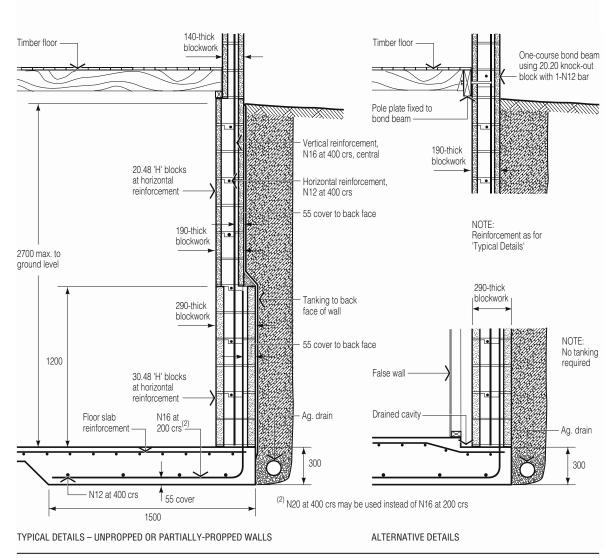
Typical Basement Wall Supporting a Timber Floor
